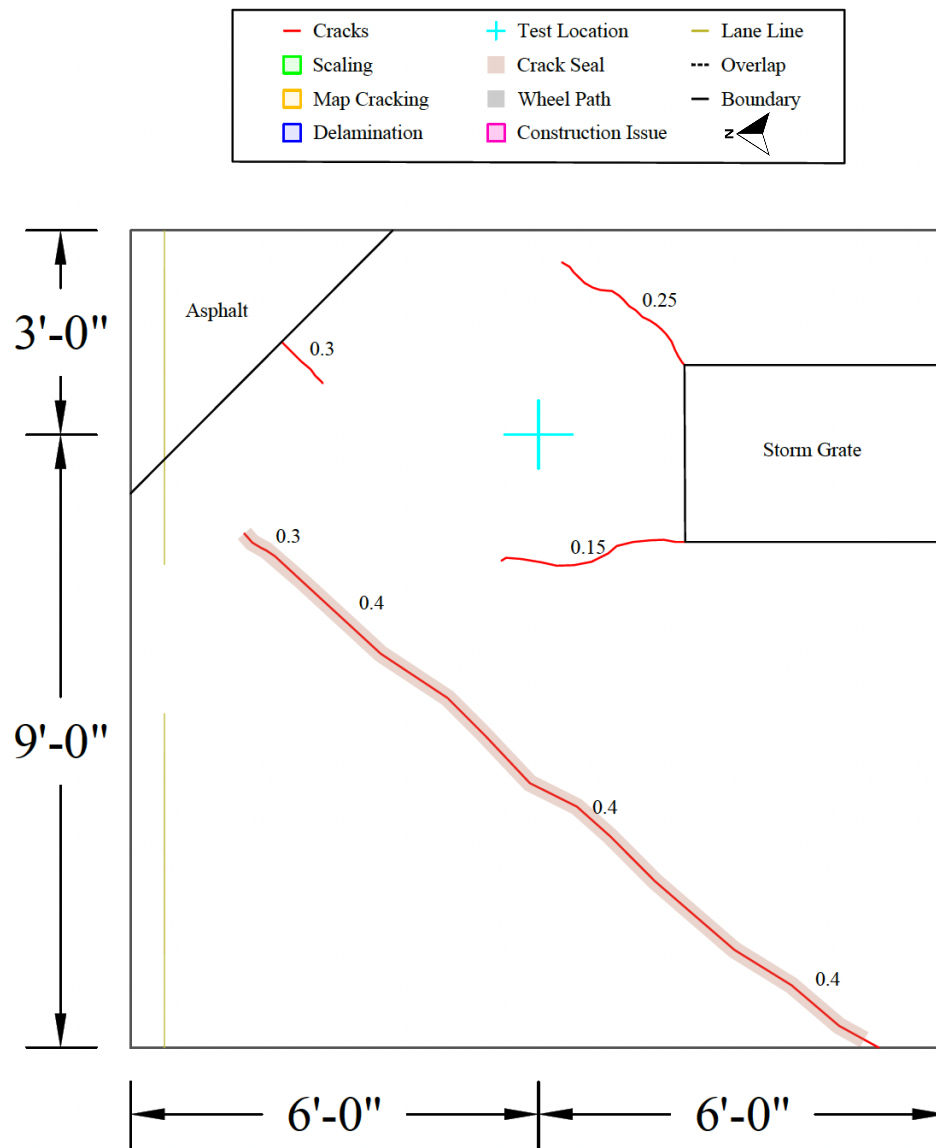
Test location 4 of normal-weight concrete approach slabs at bridge C-989.
